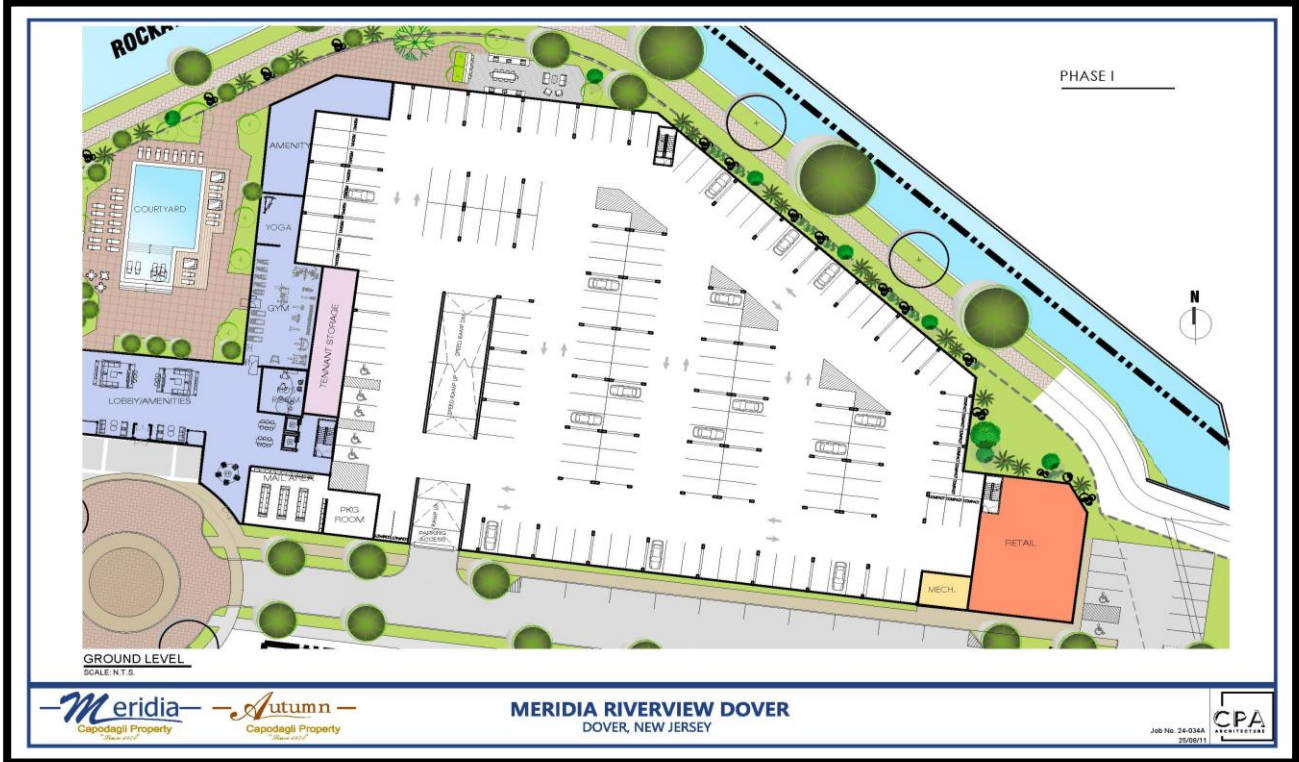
Conceptual Site Plan Building Phase 1: At Grade Parking Level Typ.
